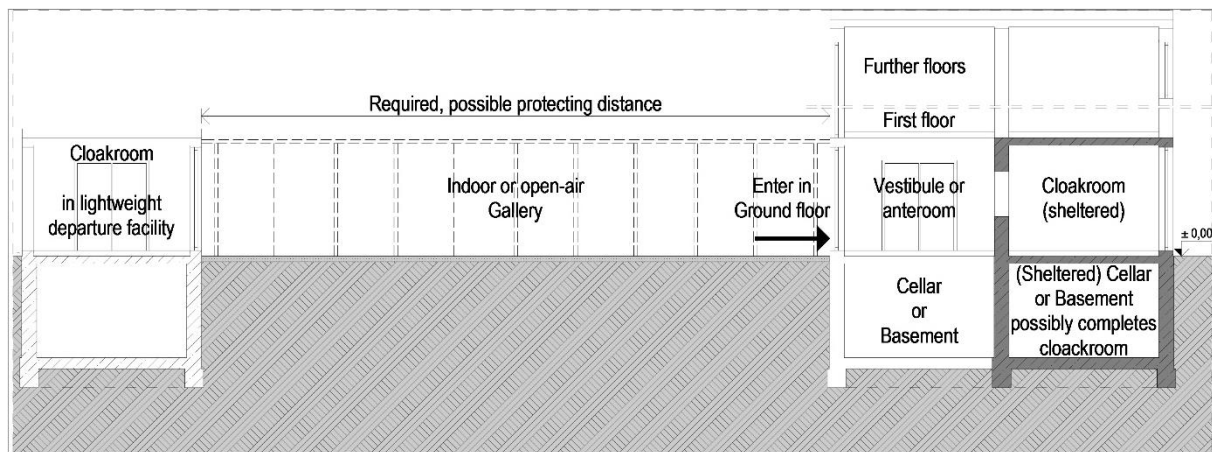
h: Sketch section drawing of possible form cloakrooms formed in lightweight departure facility or in the same public building¹⁵
